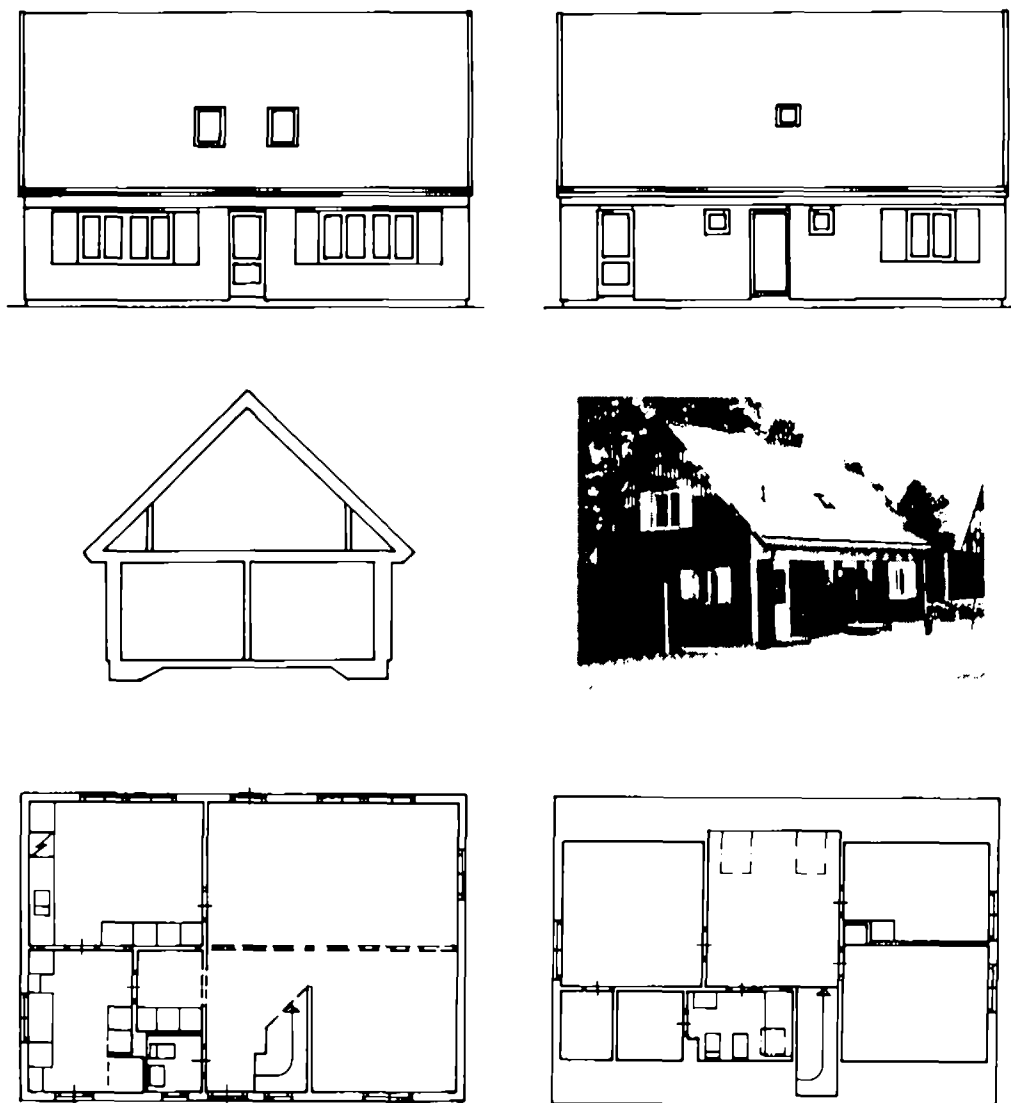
Elevations and plans for a single-family house in Sweden in wood-frame construction. The living area is approx. 130 m<sup>2</sup>.
